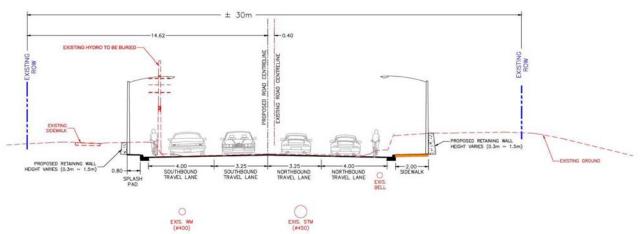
Typical Section - Ceremonial Drive to Matheson Boulevard West (Sta11+300)
